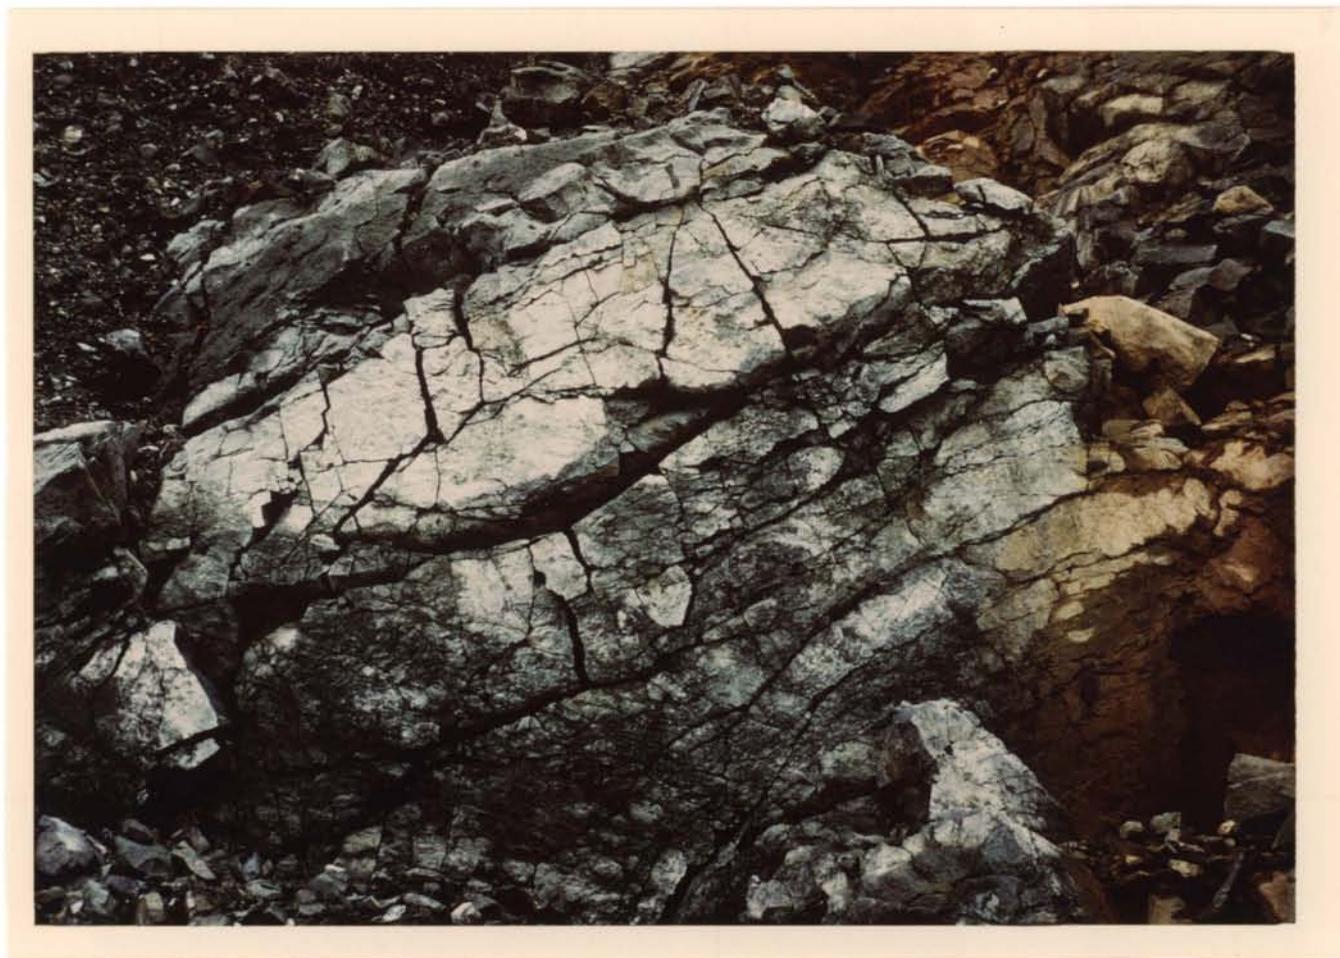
Central part of west wall. Damage to a competent rock caused by overblasting.
